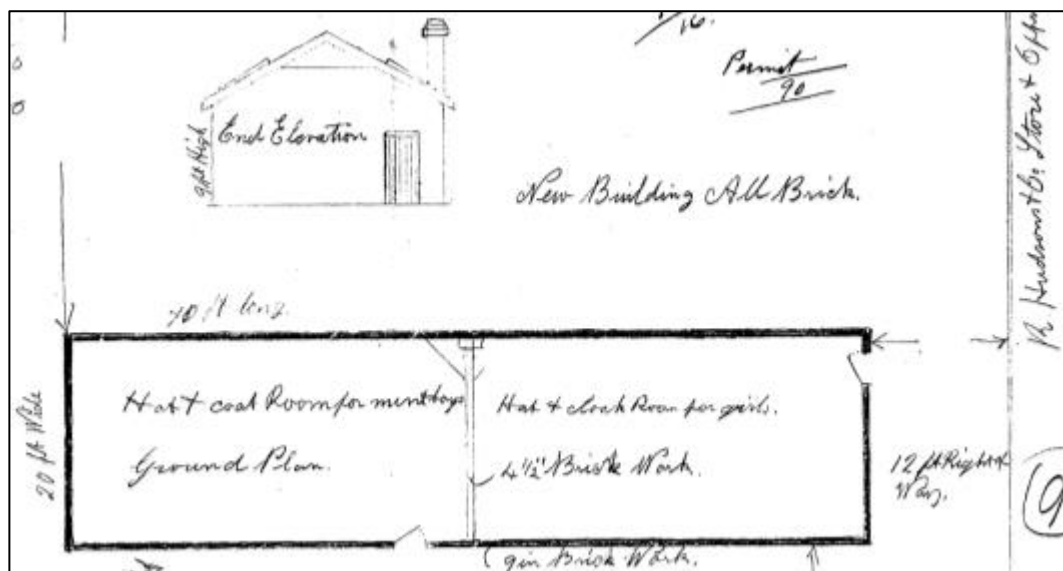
Plans for a cloak room in front of the three-storey brick biscuit factory (DCC Archive)
